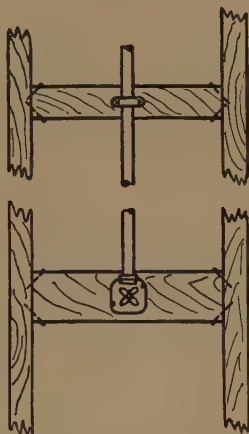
A sketch showing a run of rigid conduit terminating in an outlet box.
